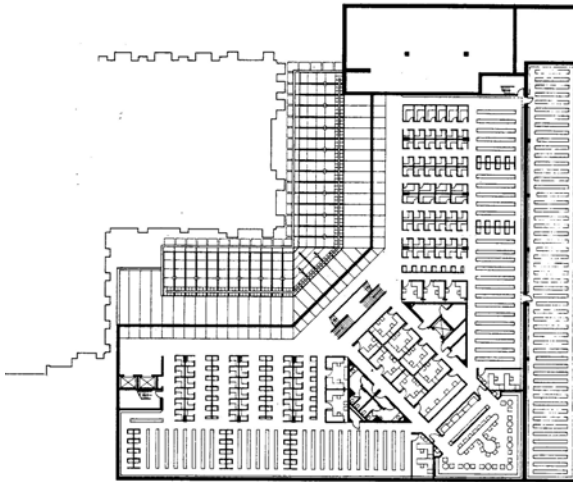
Law library three levels below grade plan showing the student lounge at the southeast corner of the building
